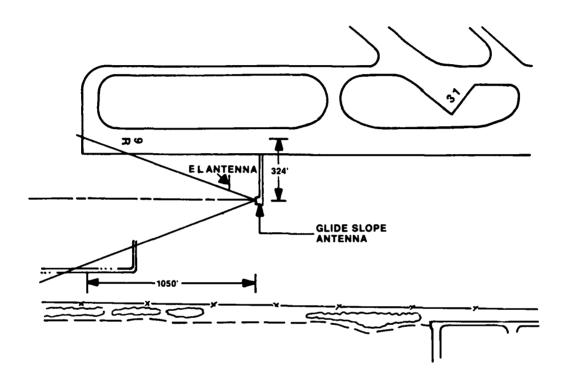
GLIDE SLOPE AND ELEVATION LOCATIONS
